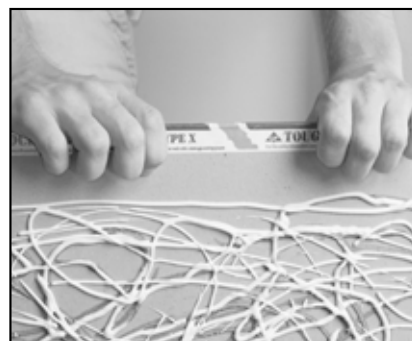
Leave a 2-3" boarder around the edge of drywall
